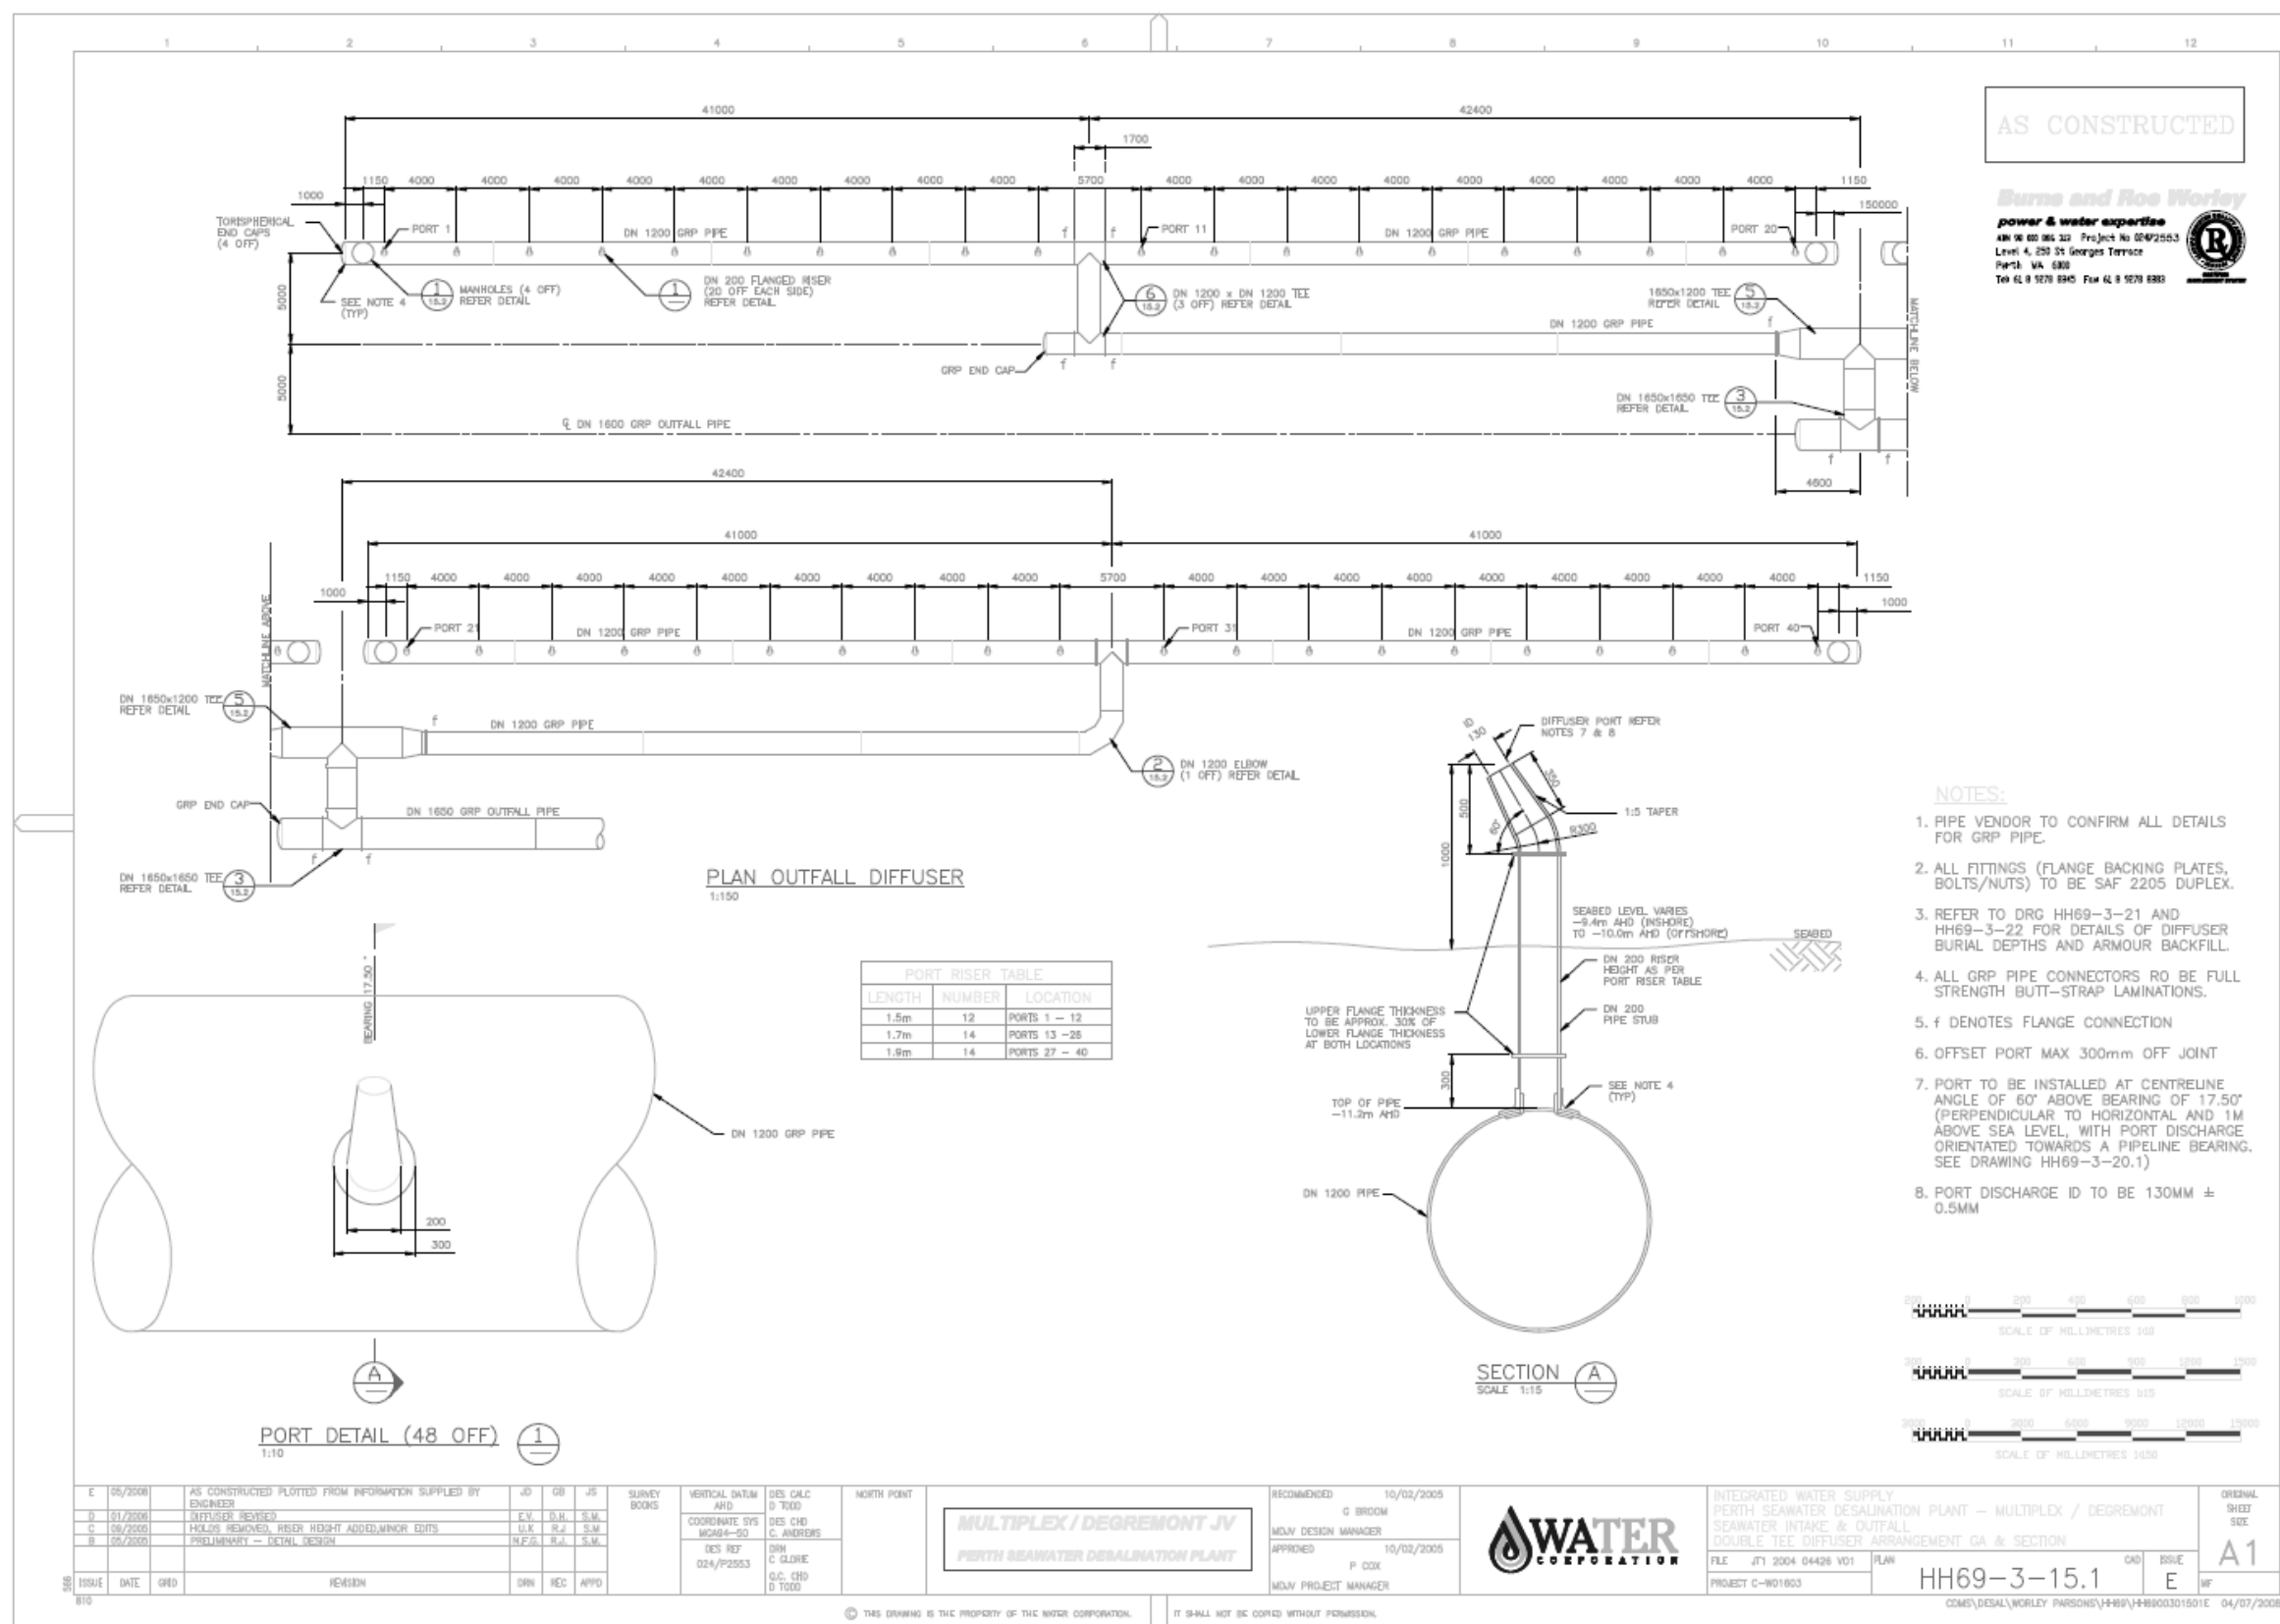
Seawater intake & outfall – double tee diffuser arrangement GA & section
